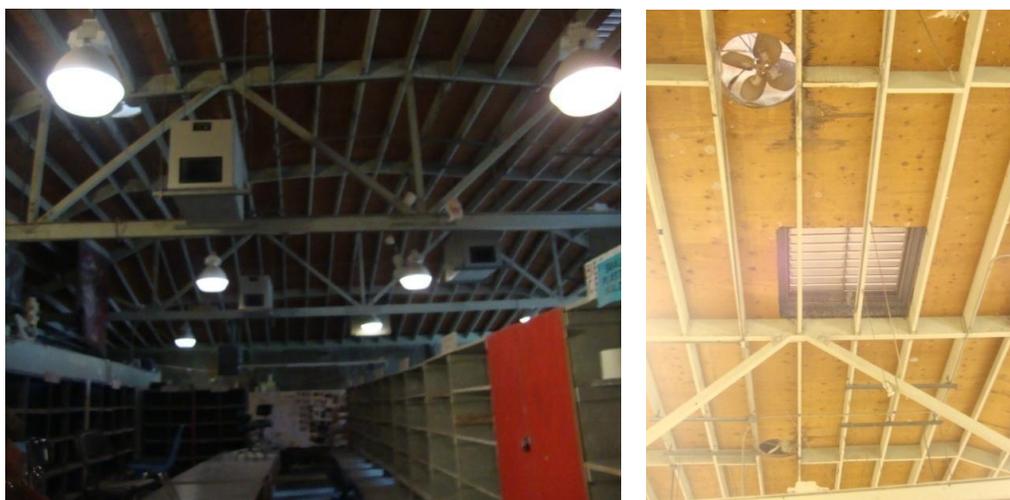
Roof without ceiling or insulation and with roof vents.
